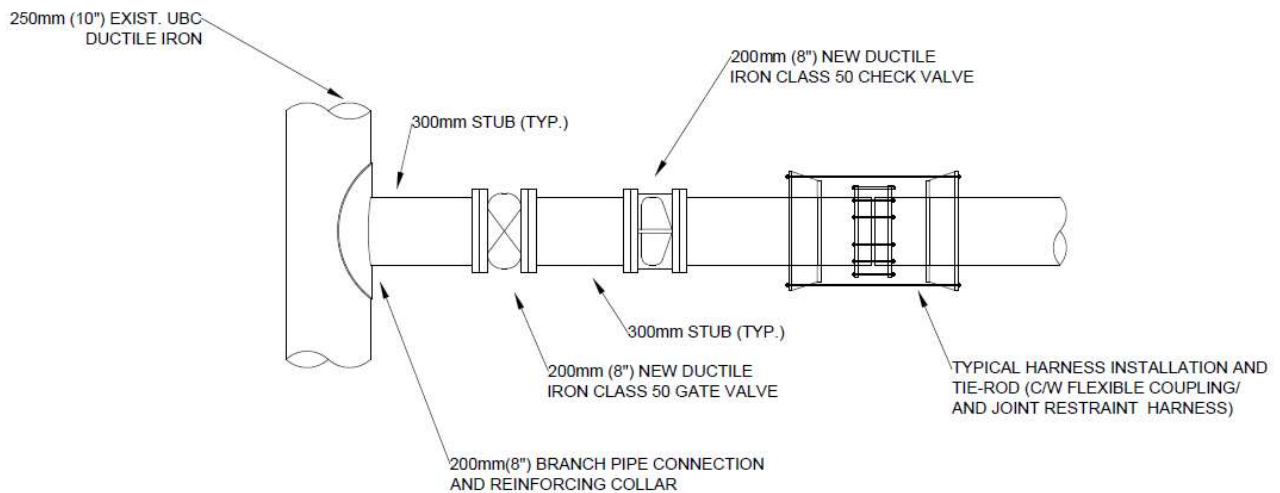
EXCERPT OF DETAILED INFLOW CONNECTION DESIGN
